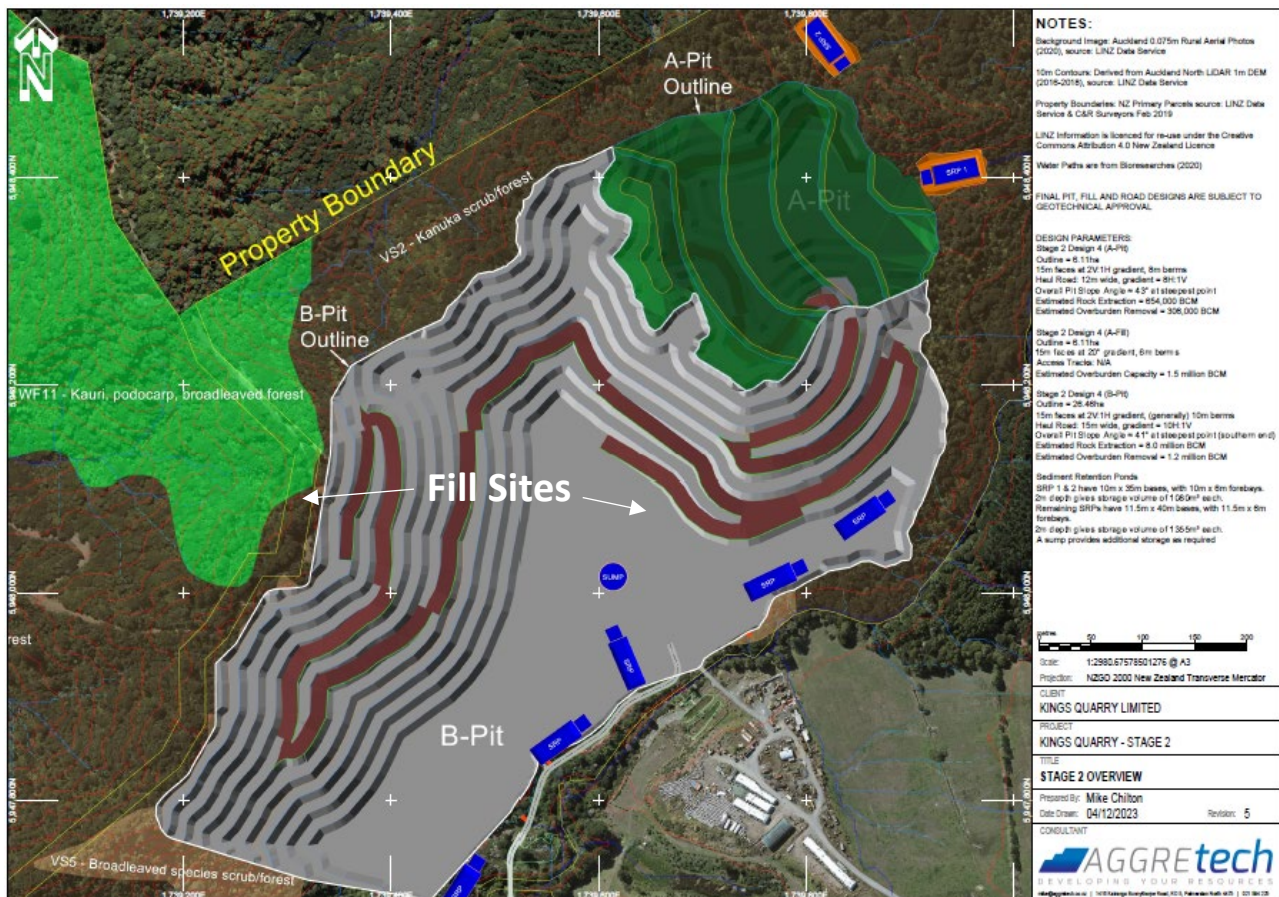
Stage 2 site layout, general design including overburden area and sediment retention ponds
